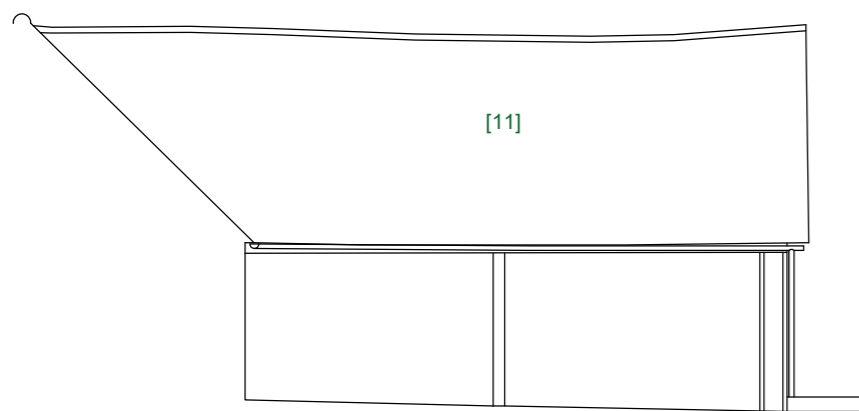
Old Arngrove Farm, Cart Store, North-West Elevation
